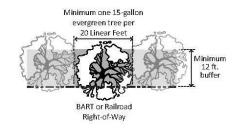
N.1.C: BUFFER AREA LANDSCAPING
